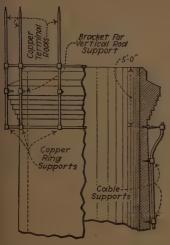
Elevation, half sectional, of chimney top, showing terminal rods.
